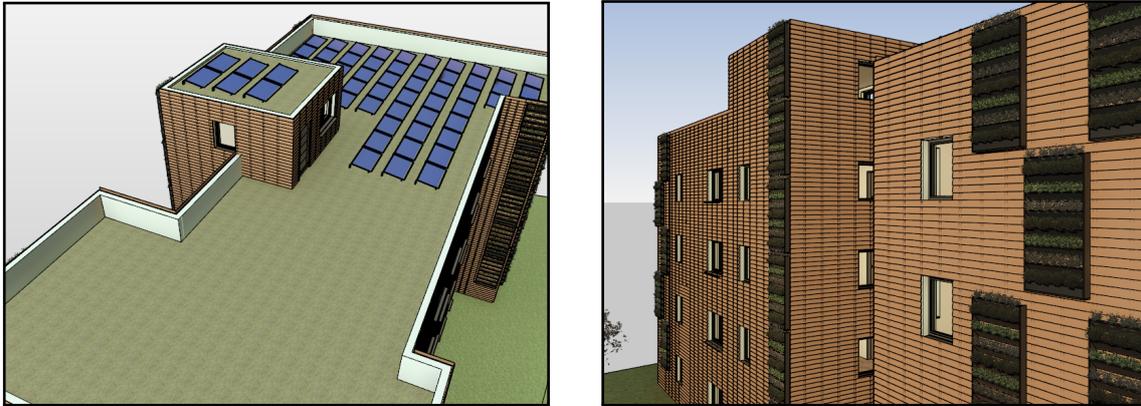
Accessible green roof with PV panels and green wall elements on the north side of the building (screenshots in *Revit*)
